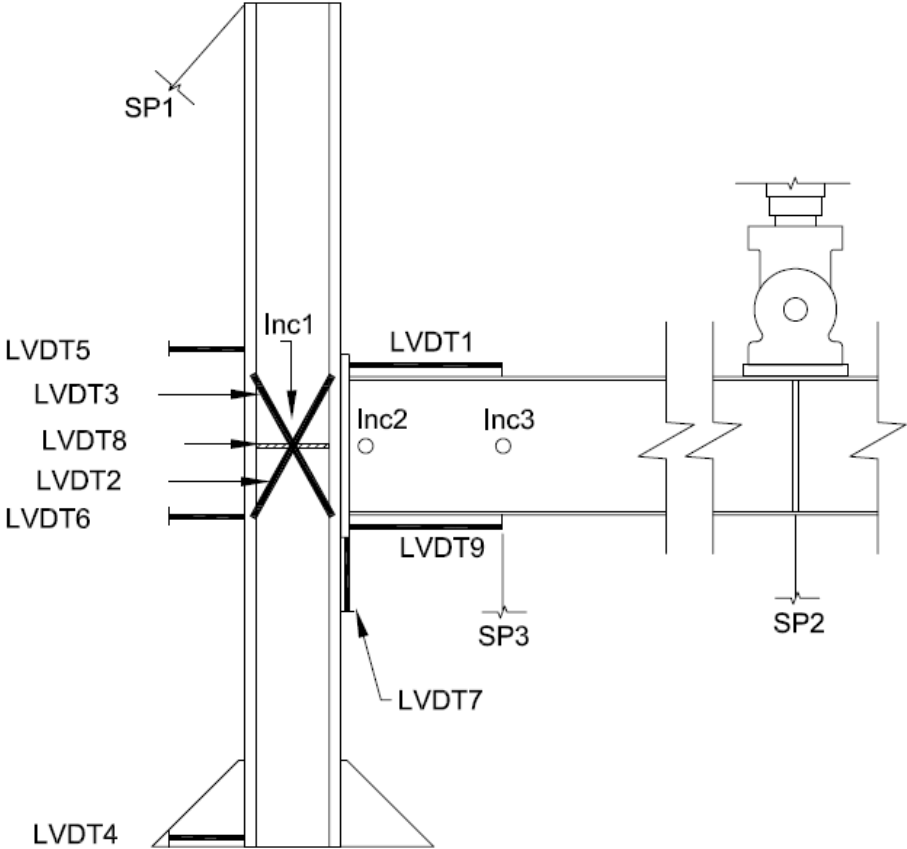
General LVDT and String Potentiometer Layout (Not To Scale)
